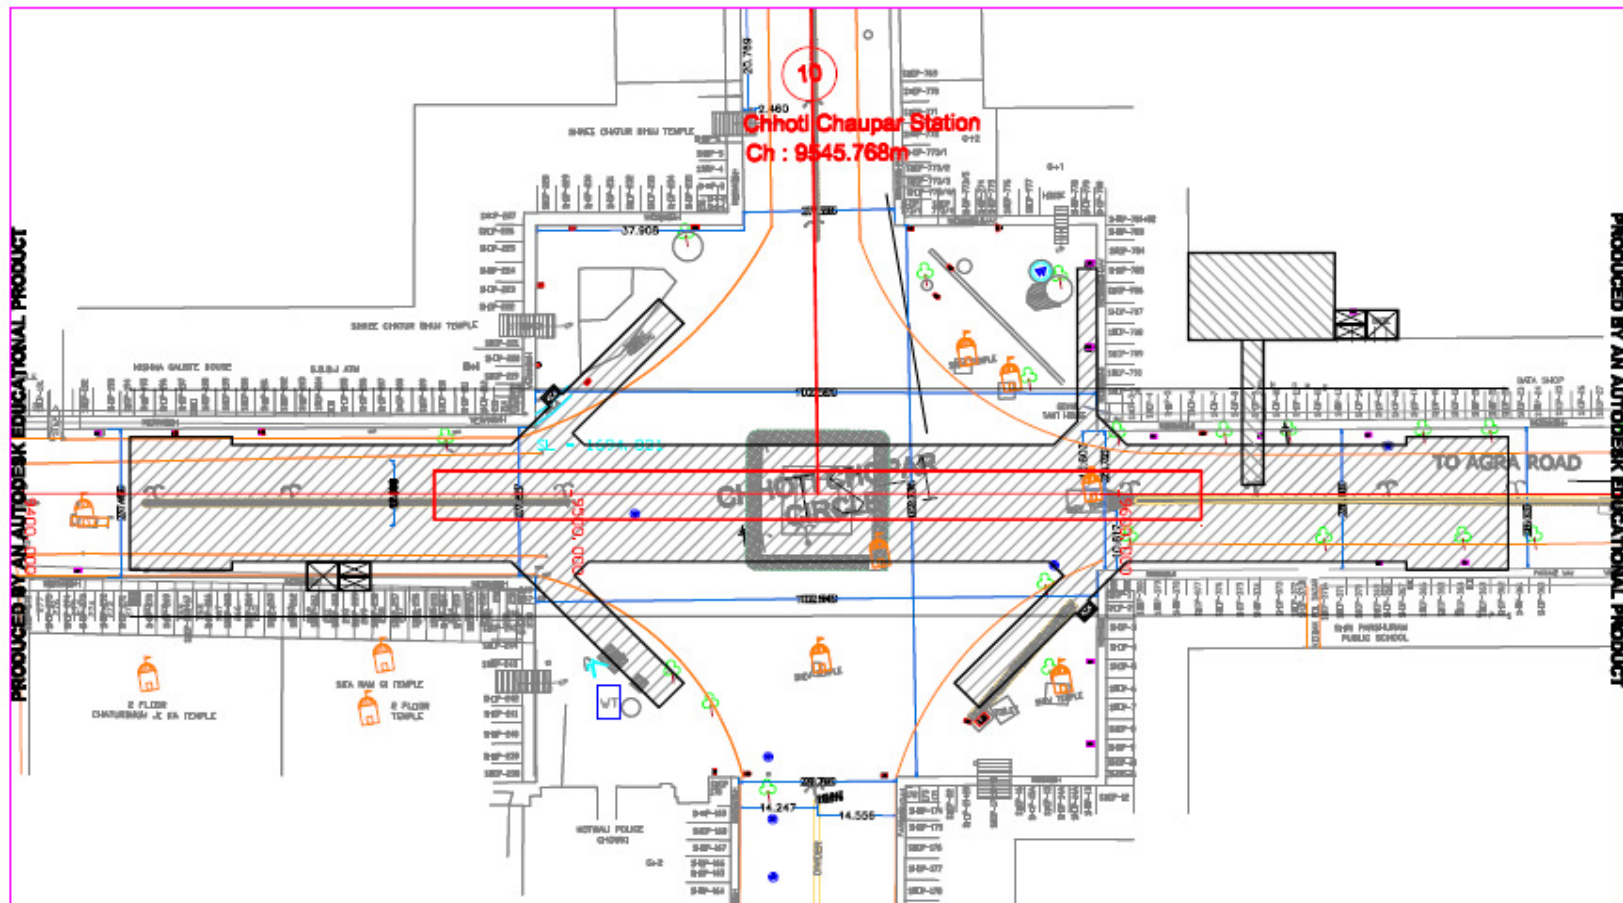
General Layout Plan (Choti Choupar Metro Station)
